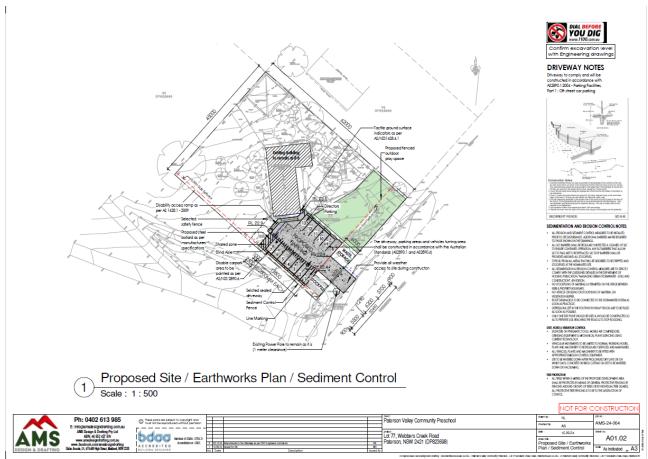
Site Plan (Source: drawing from AMS Design & Drafting)
